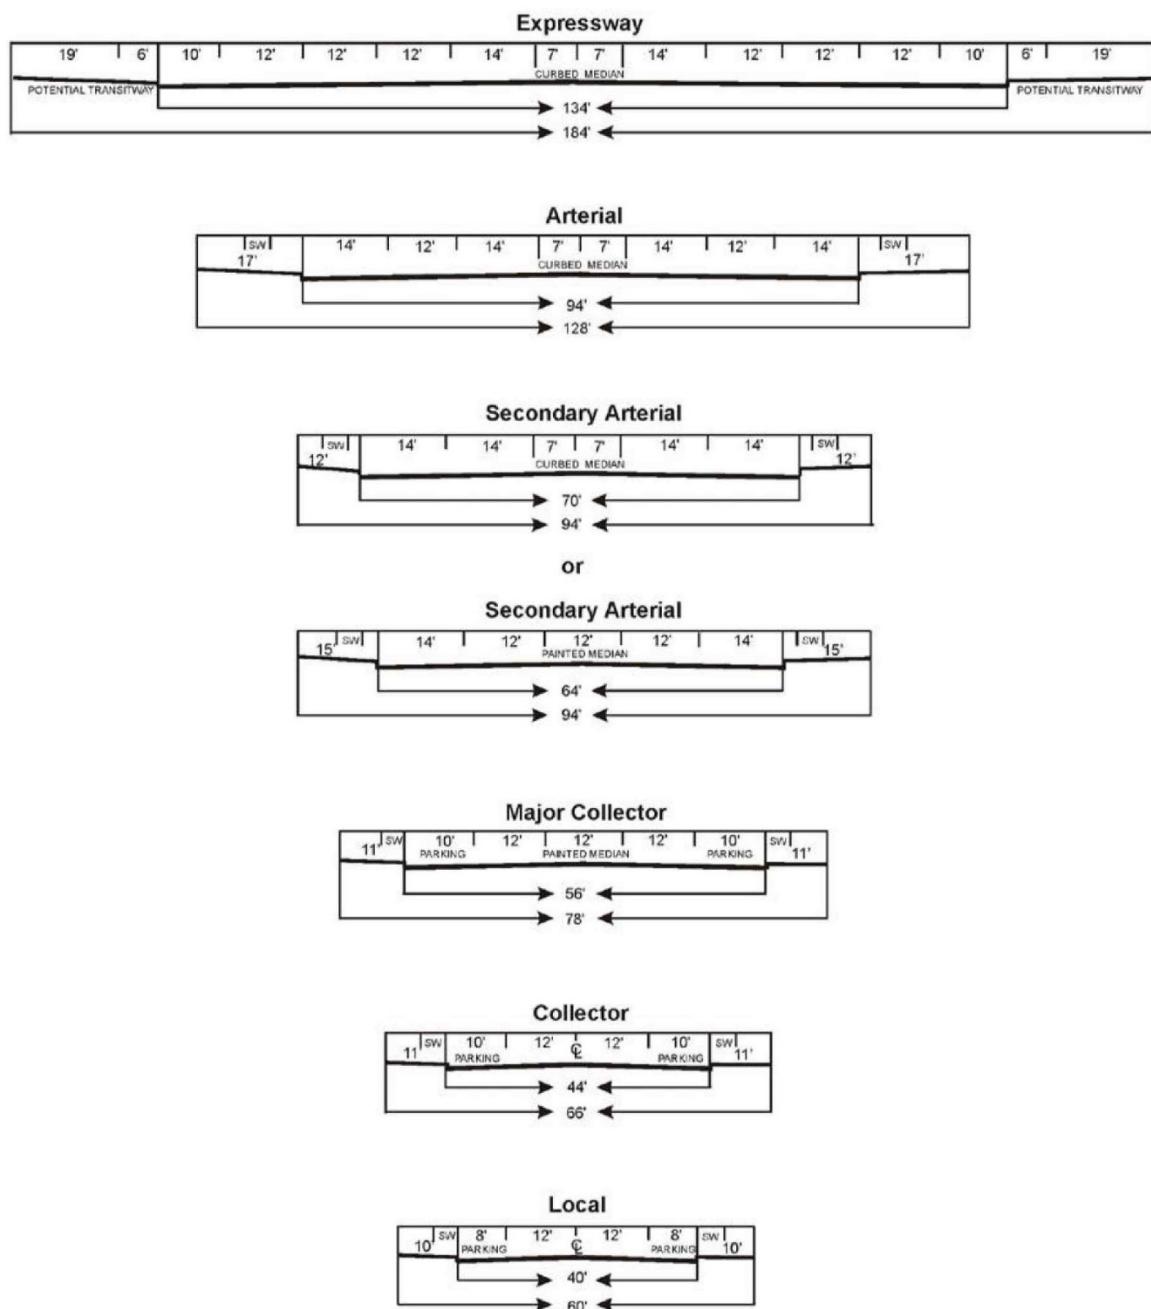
CITY OF PERRIS GENERAL PLAN ROADWAY CROSS-SECTIONS
